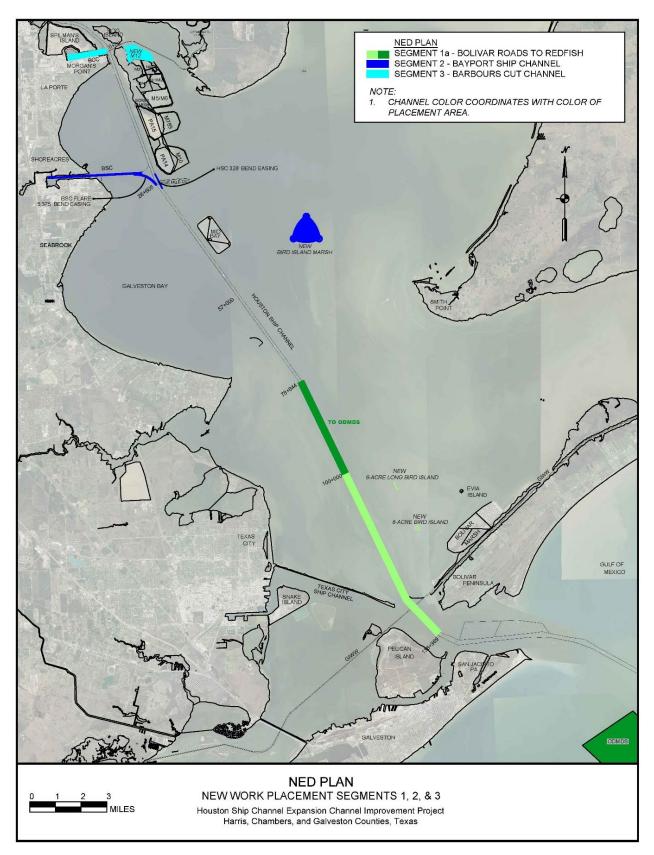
NED Plan New Work Proposed Placement Segment 1, 2, & 3
